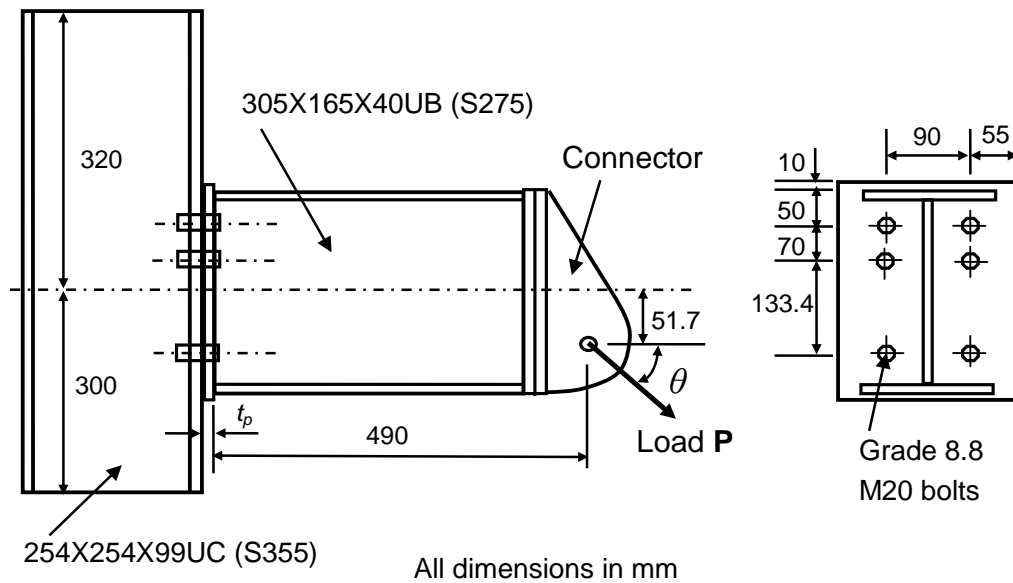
Details of test specimens used by Yu et al. (2009d)
